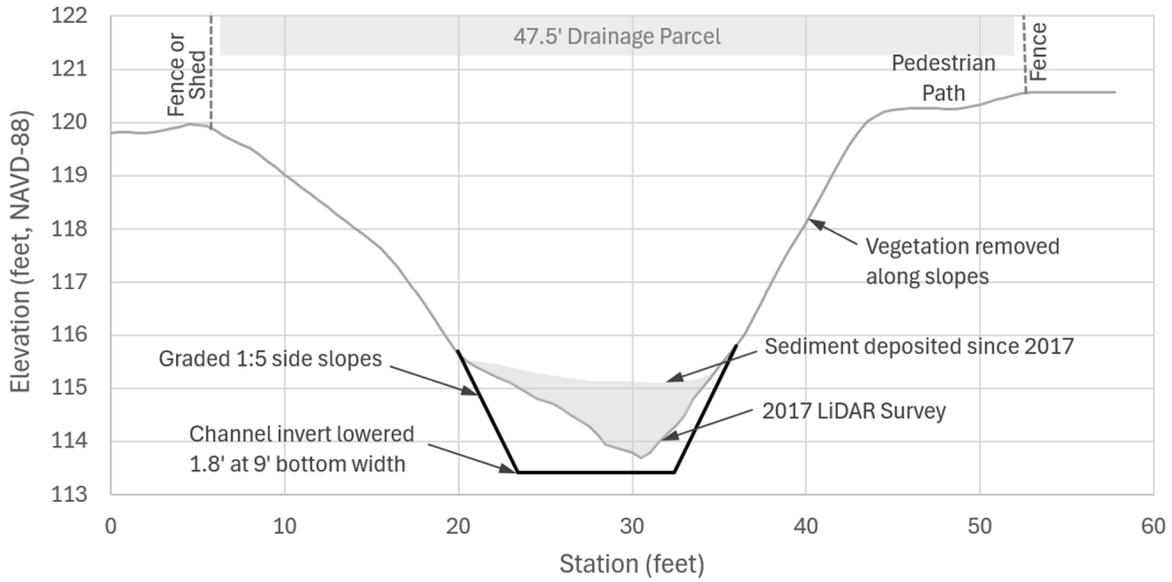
Alternative 5 representative graded section between Ferracci Park and Paul Avenue.
